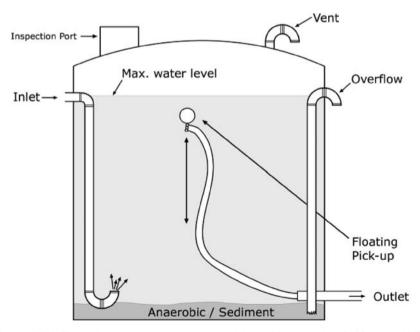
Typical rainwater storage tank piping with 'quiet inlet'. (*Source*: WC3 Design, 2013).
